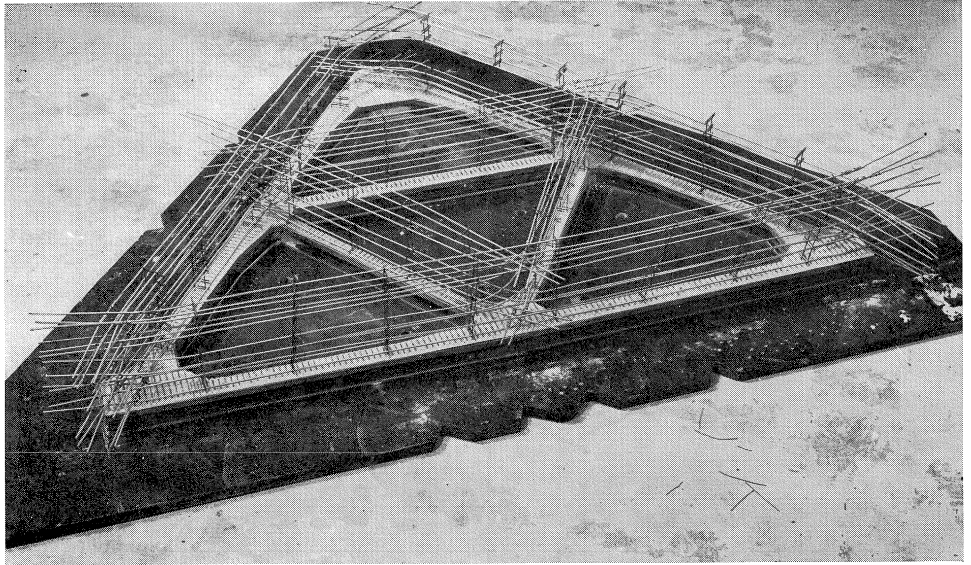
The method of forming and locating the ducts for the transverse prestressing wires.
